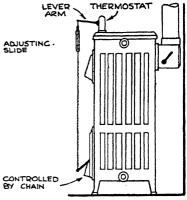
Damper Regulator, showing Method of Fitting to Small Heating Boiler.
